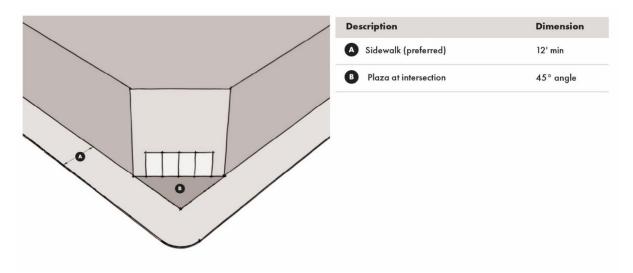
JJ: CORNER PLAZA AT THE INTERSECTION
